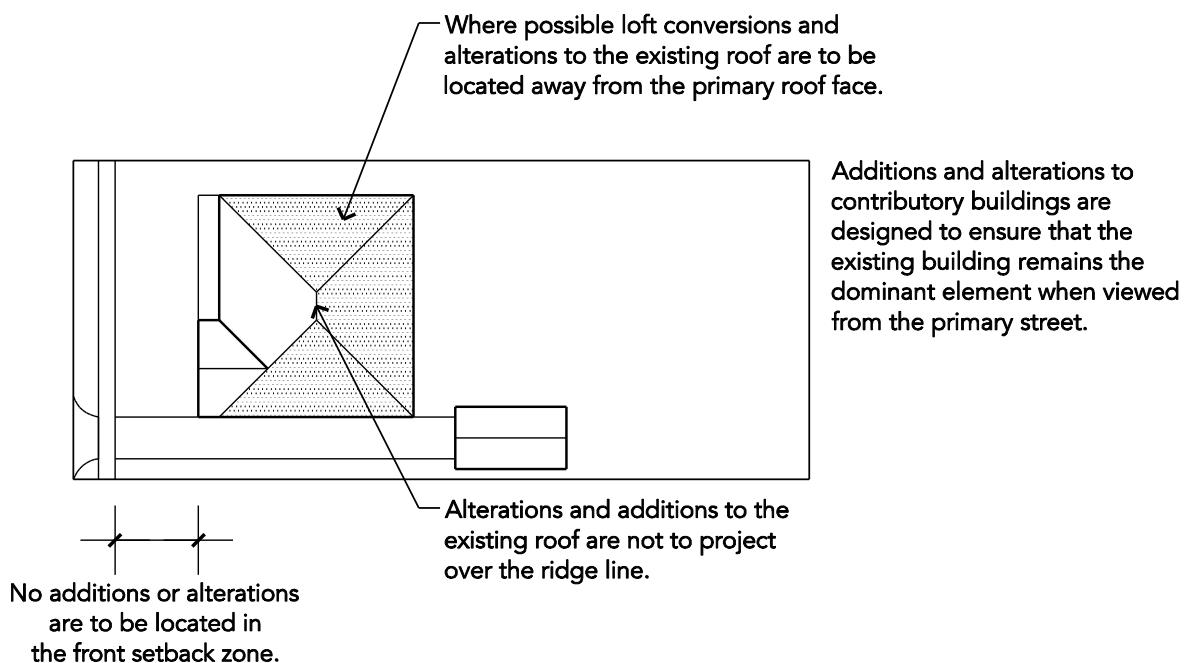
Plan illustrating compatible and incompatible roof conversions – Griffiths Architects 2012.
